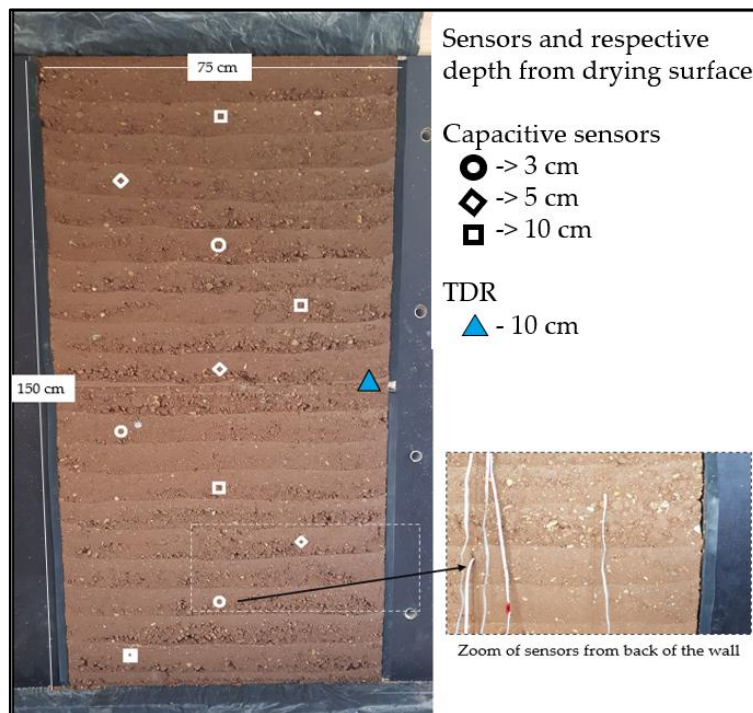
Layout of the position of the sensors with their respective depth in the wall. Zoom of the sensor's final position taken from the back of the wall.
